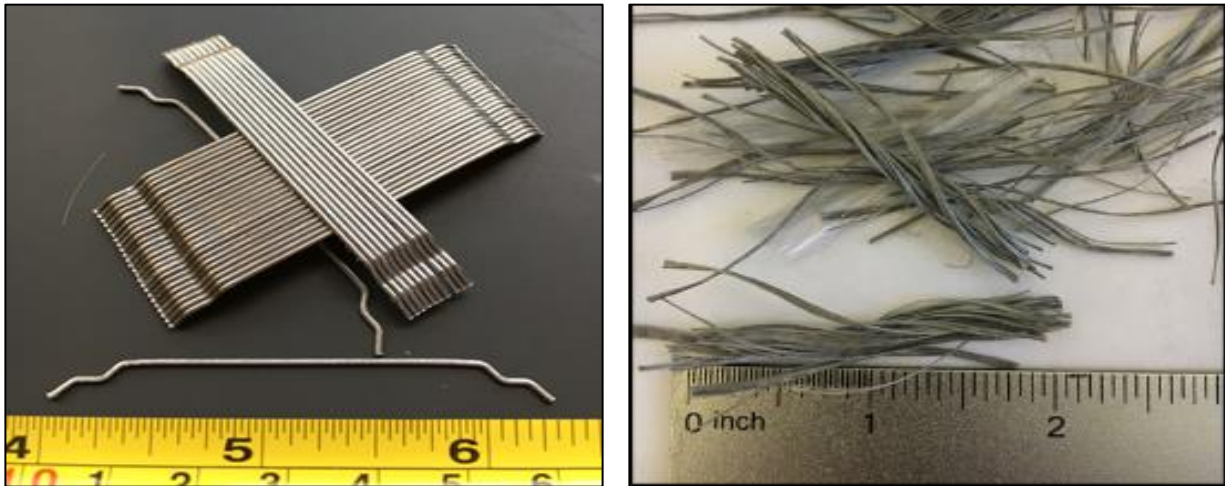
Steel structural fiber (left) and synthetic structural fiber (right).
